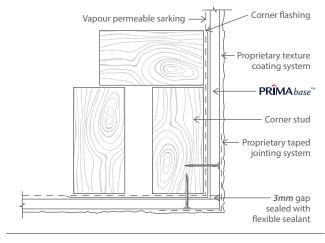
External Corner (Tape Reinforced Flexible Joint)
